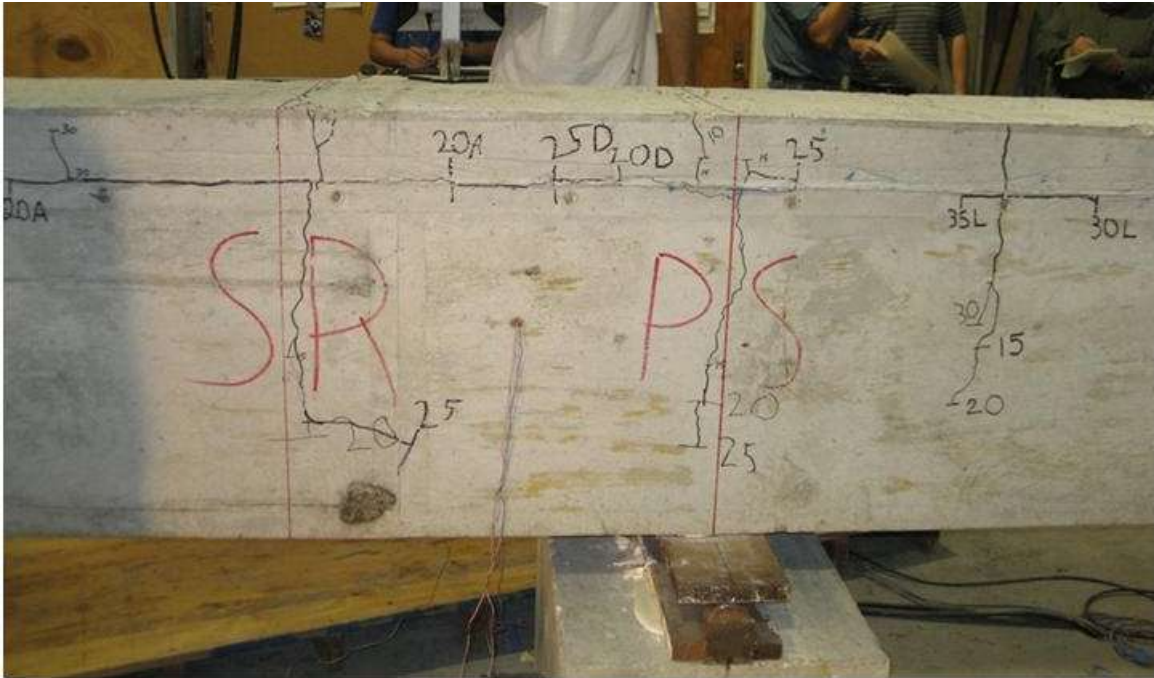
Beam 4, south side of west splice region with horizontal cracks, 35-kip end load.
